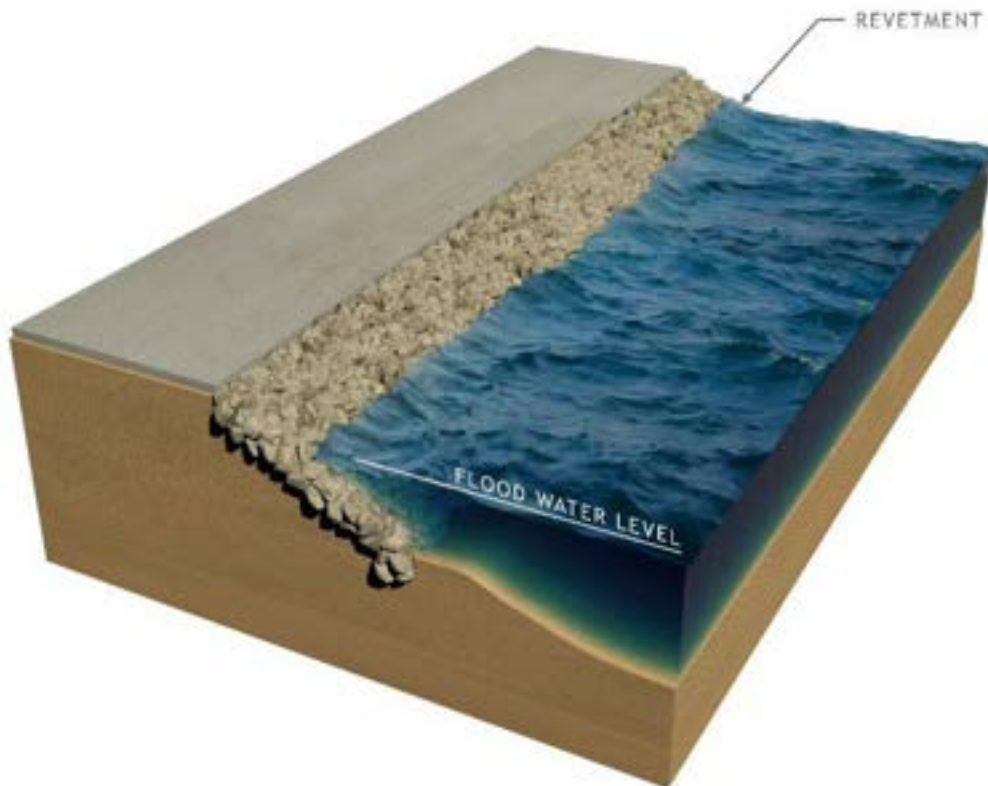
Conceptual example of a rock revetment used to stabilize shorelines subject to severe erosion.
